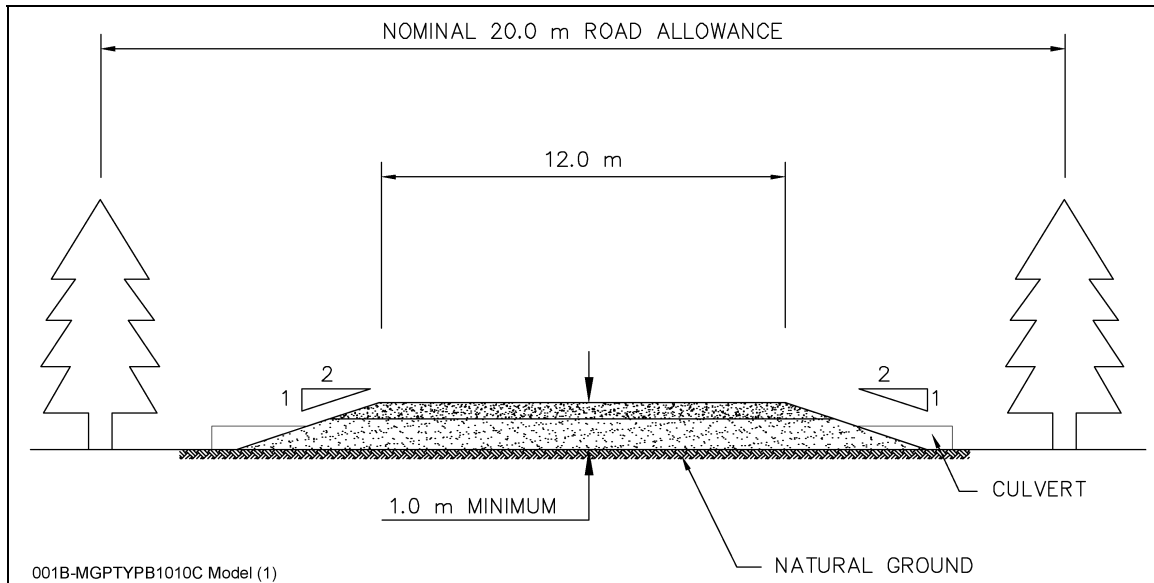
Typical All-Weather Access Road (12.0 m)
